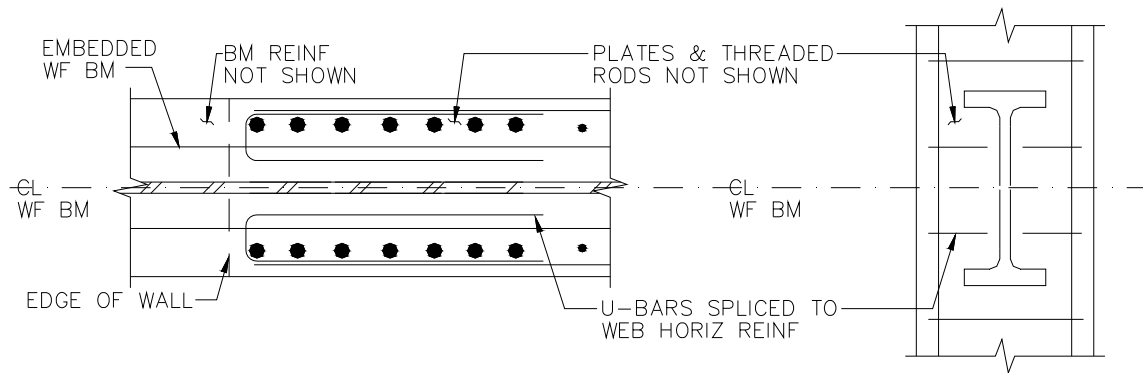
Embedment Detail (Plan View and Elevation View)
